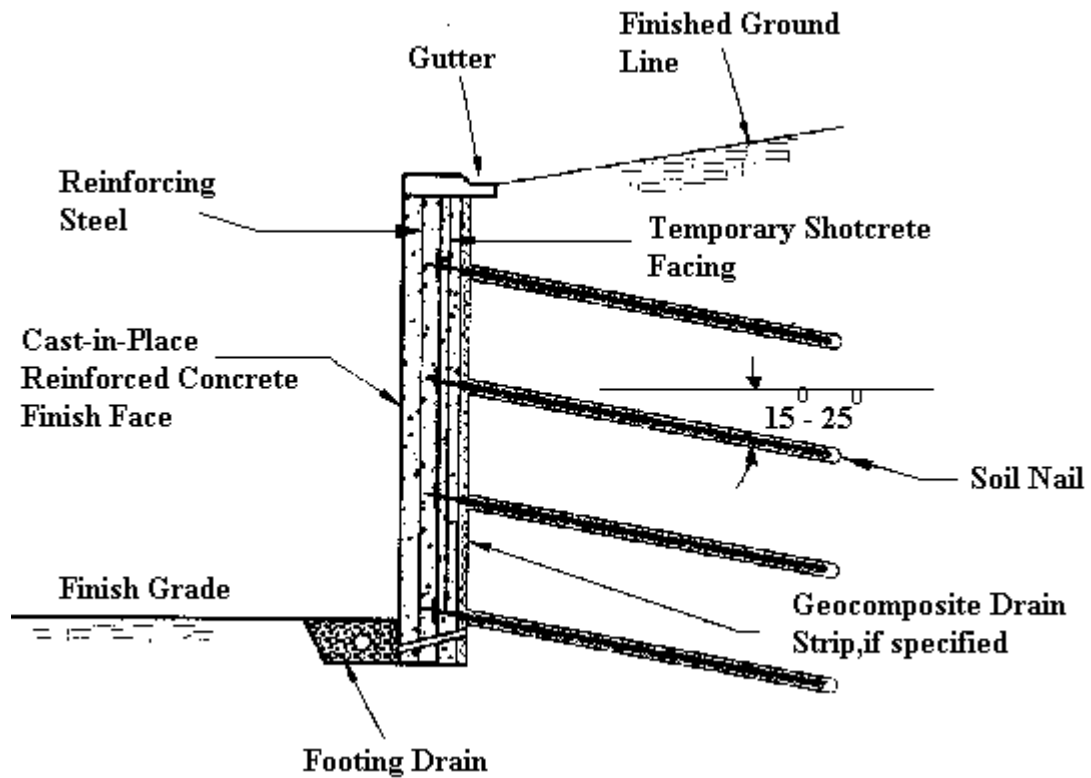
Typical structural Cast-in-Place reinforced concrete facing over temporary shotcrete [3]
